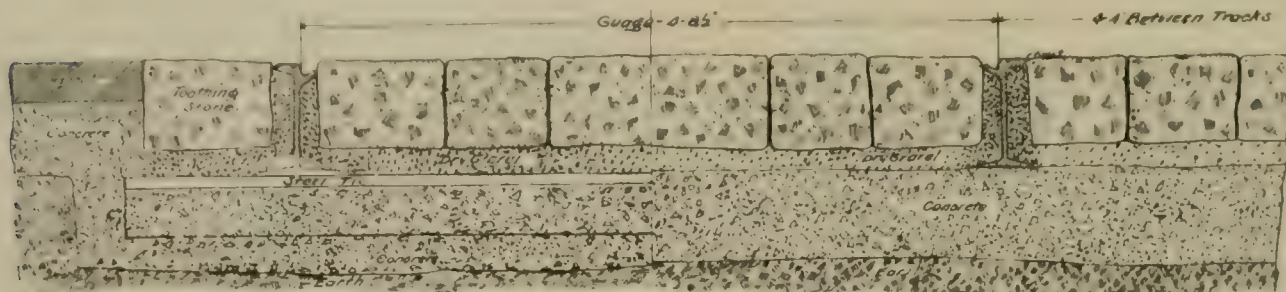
CROSS SECTION OF 9-IN. TRACK IN ASPHALT STREET, BLOCK PAVING IN TRACK AND DEVIL STRIP.
